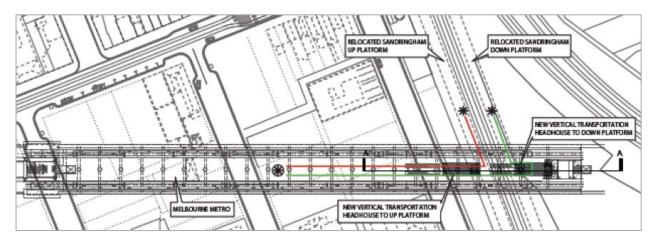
New South Yarra Underground Station (MM Platforms) including relocated Sandringham Platforms
